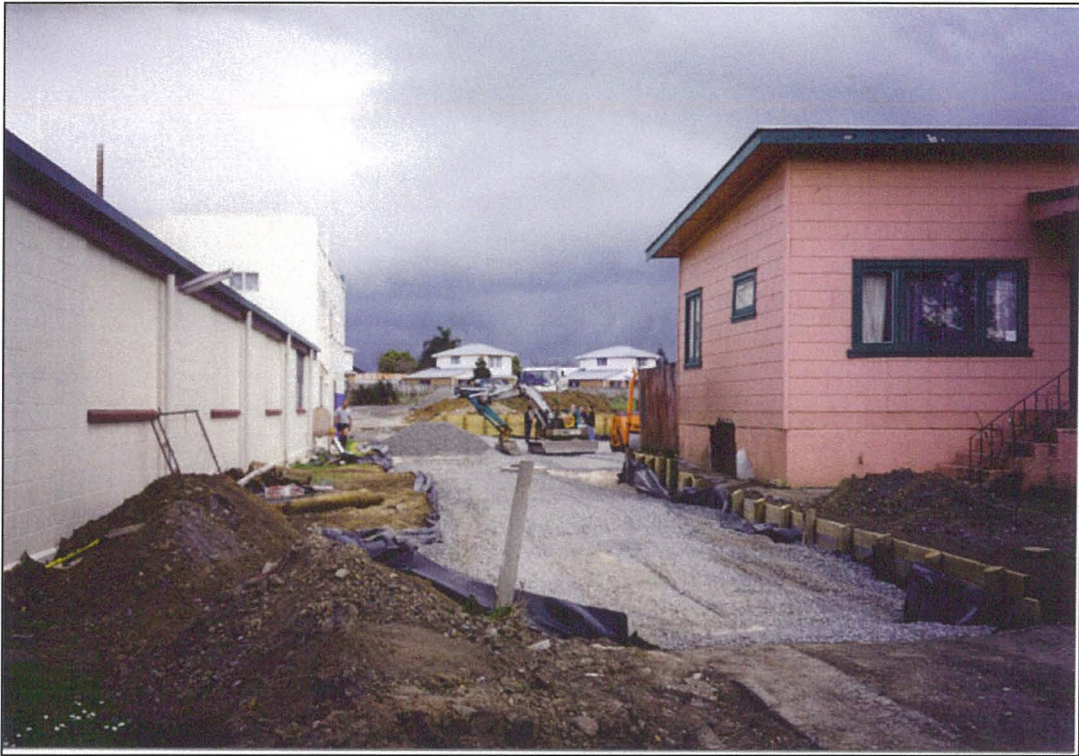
DRIVEWAY AREA BEING CONSTRUCTED.
